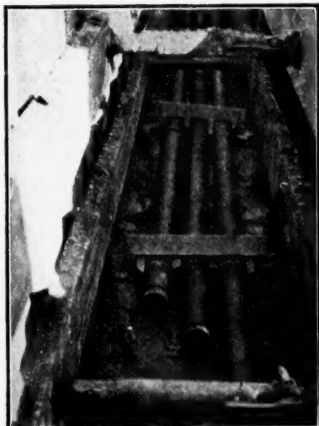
Forms for Shoring, Spacing Combs and Plugs
